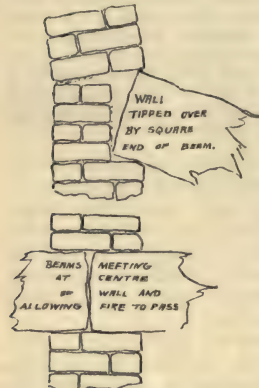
BAD METHODS OF RESTING BEAMS ON WALLS.
